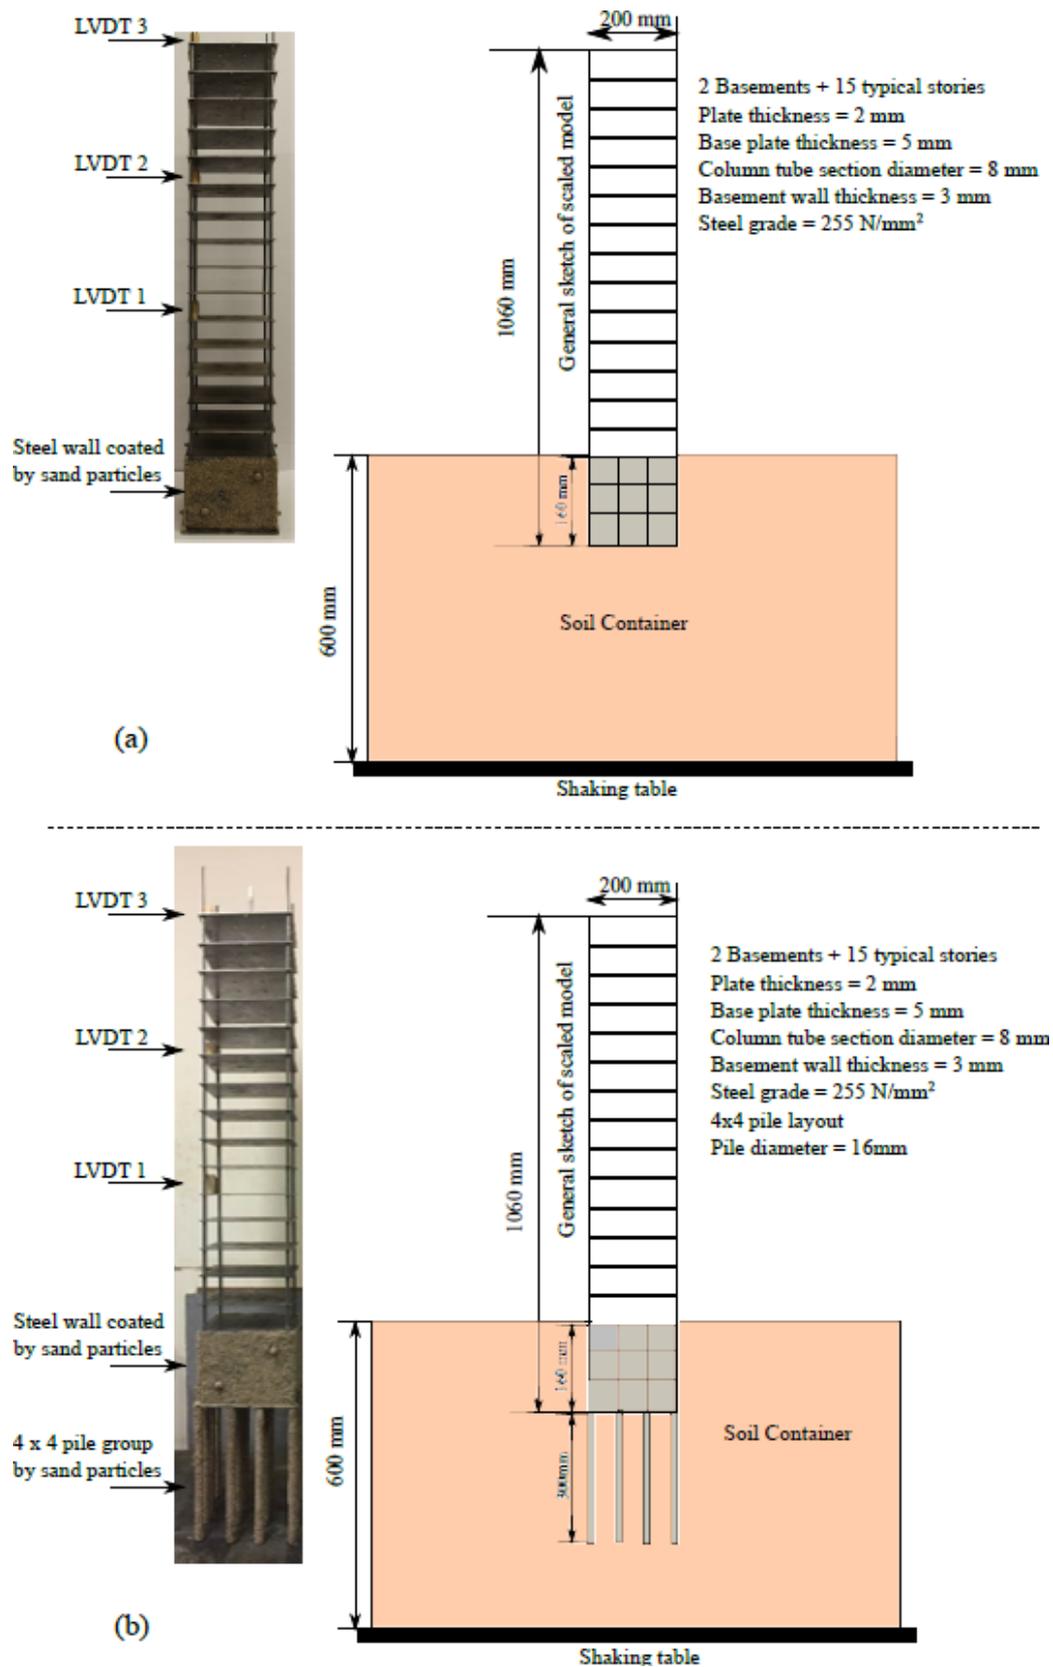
Structures supported by (a) raft foundation and (b) raft-on-pile foundation
